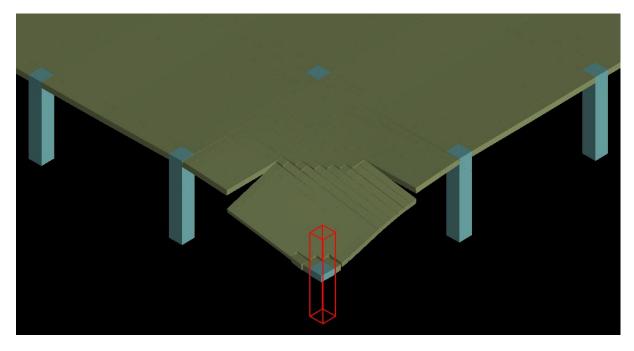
The failure mechanism at the top reinforcement curtailments in the first story of the building with a span ratio of 1 (at second 1.15 of the analysis).
